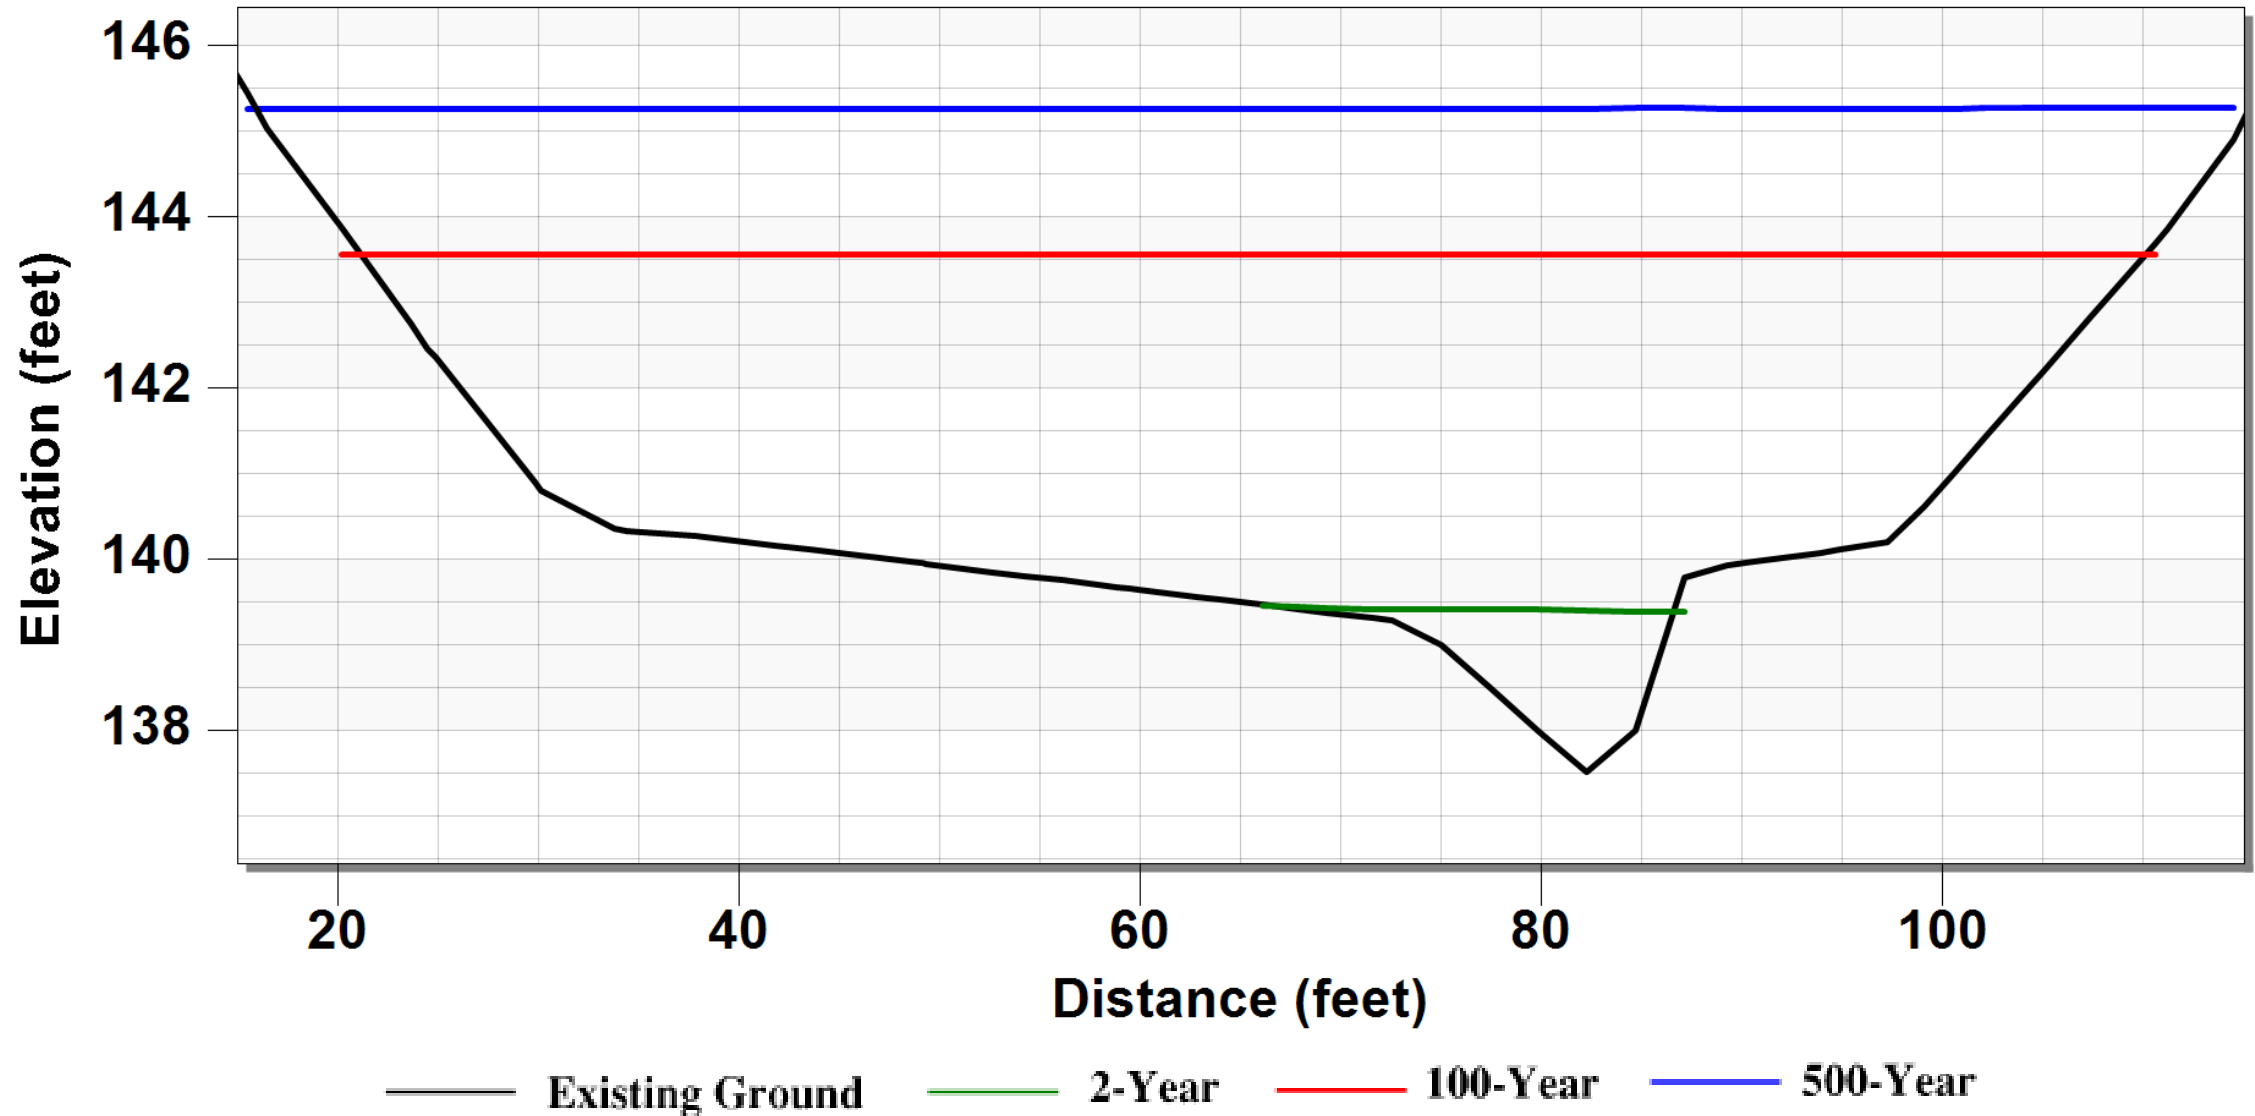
Existing conditions cross section at upstream station 7+00 (E)
